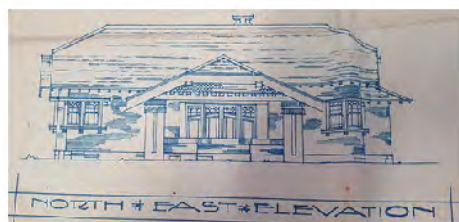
5A Vivian Street, Bellevue Hill North-East Elevation
